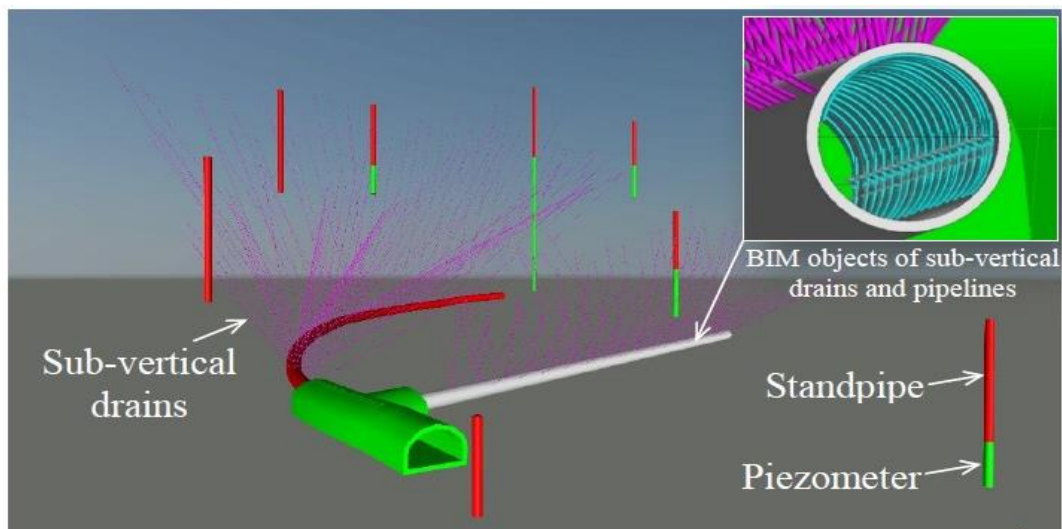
Po Shan Drainage Tunnels displayed on the BIM platform
